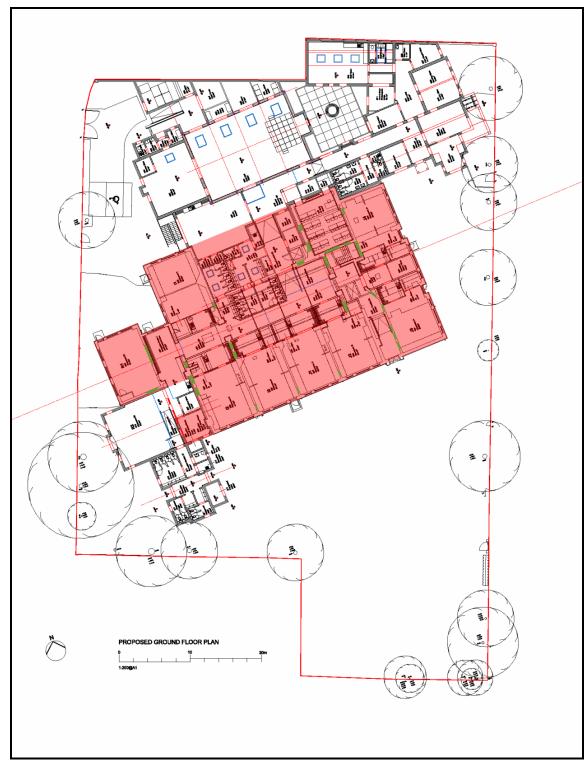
Proposed development (scale 1:500) Retained part of existing building shaded red
